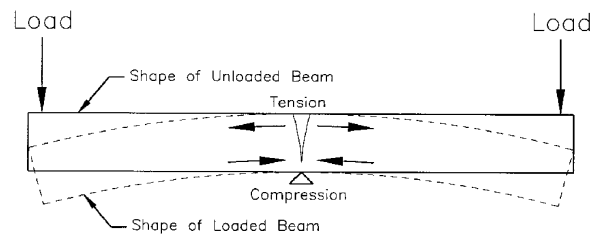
(b)—If the beam is supported in the middle and the ends are loaded (as in a cantilever beam, such as a balcony), the top of the beam over the support is in tension and will pull apart or crack if there is no reinforcing steel near the top of the beam.
